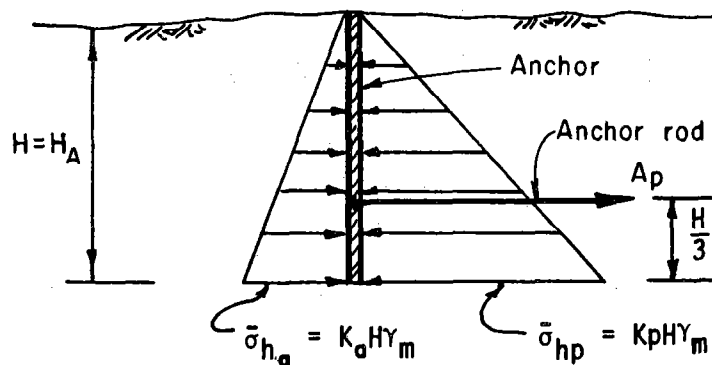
EARTH PRESSURES ACTING ON AN ANCHOR EXTENDING FROM GROUND
